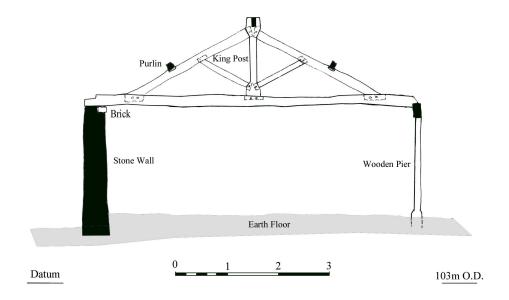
Cross section through the garage. The truss consists of a king post with struts from the tie-beam to the principle rafters. The king post truss dates from the late  $18^{th}/19^{th}$  century.
